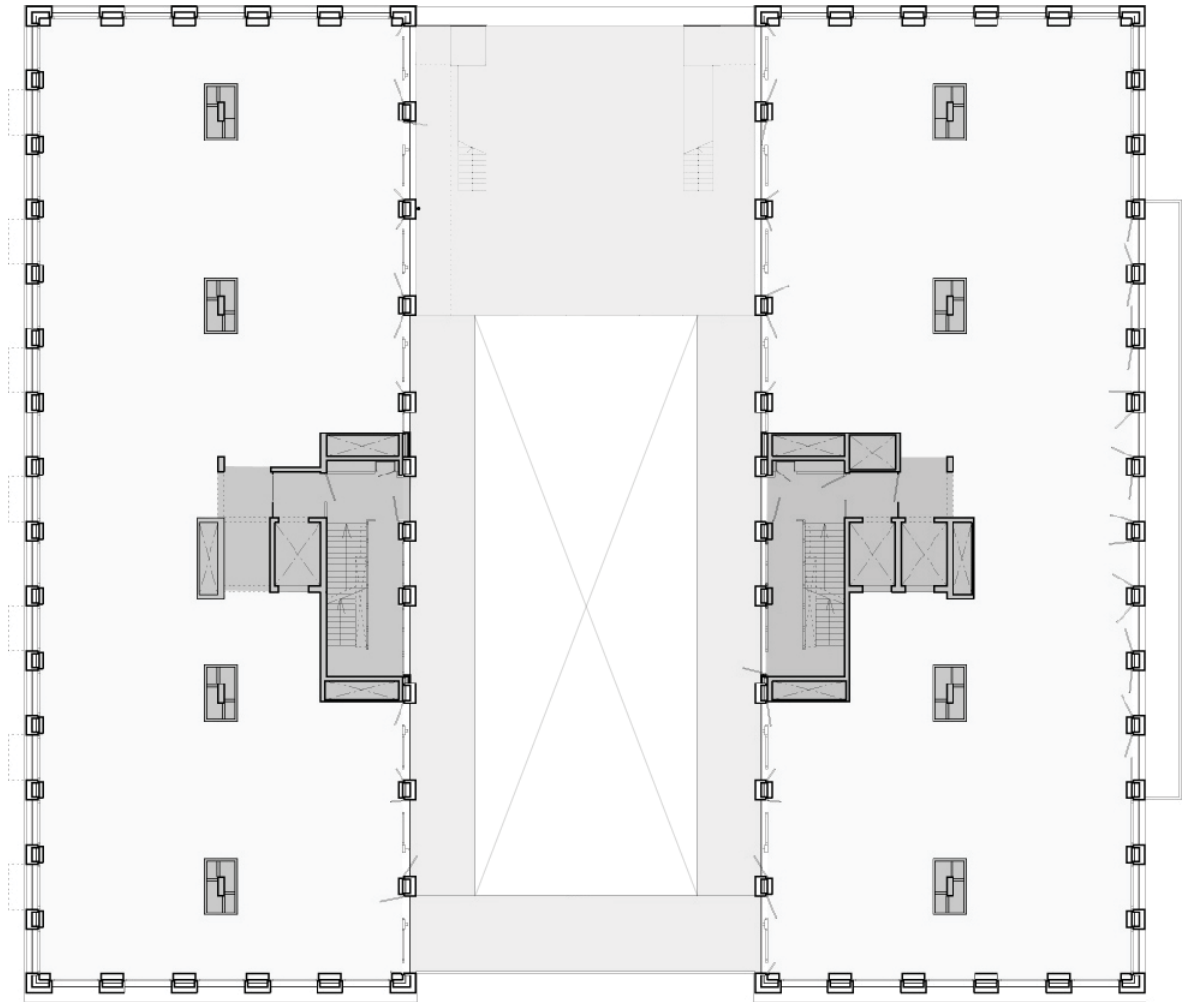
Solid Lv01 support plan (Image courtesy of Tony Fretton Architects).
